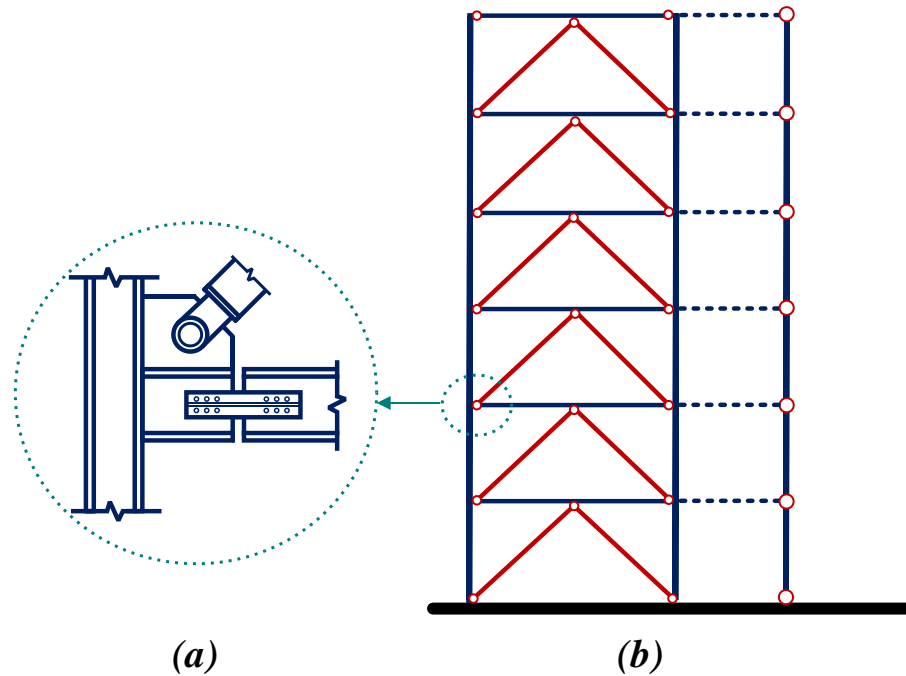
The 6-story demonstration building: (a) brace-frame and beam-column joints; (b) computer model elevation [113].
